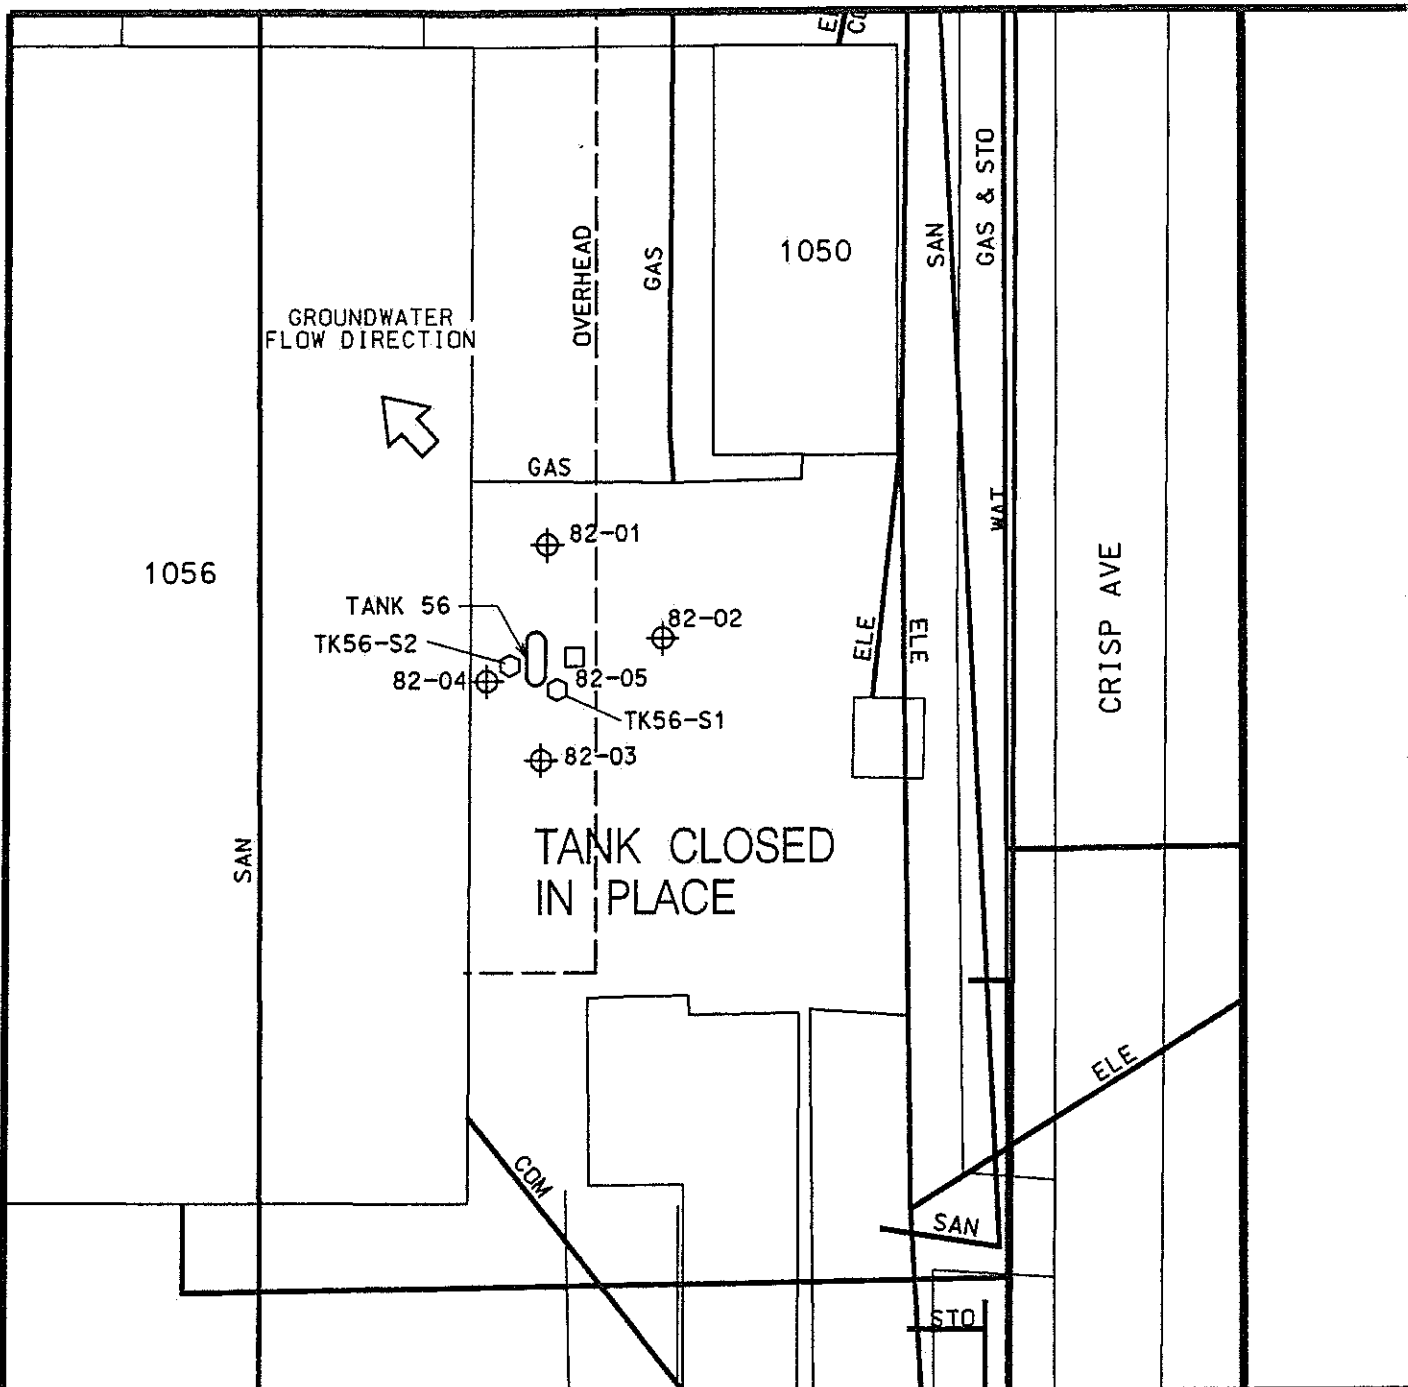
Site Plan for the UST 56, Building 1056 Site Investigation
